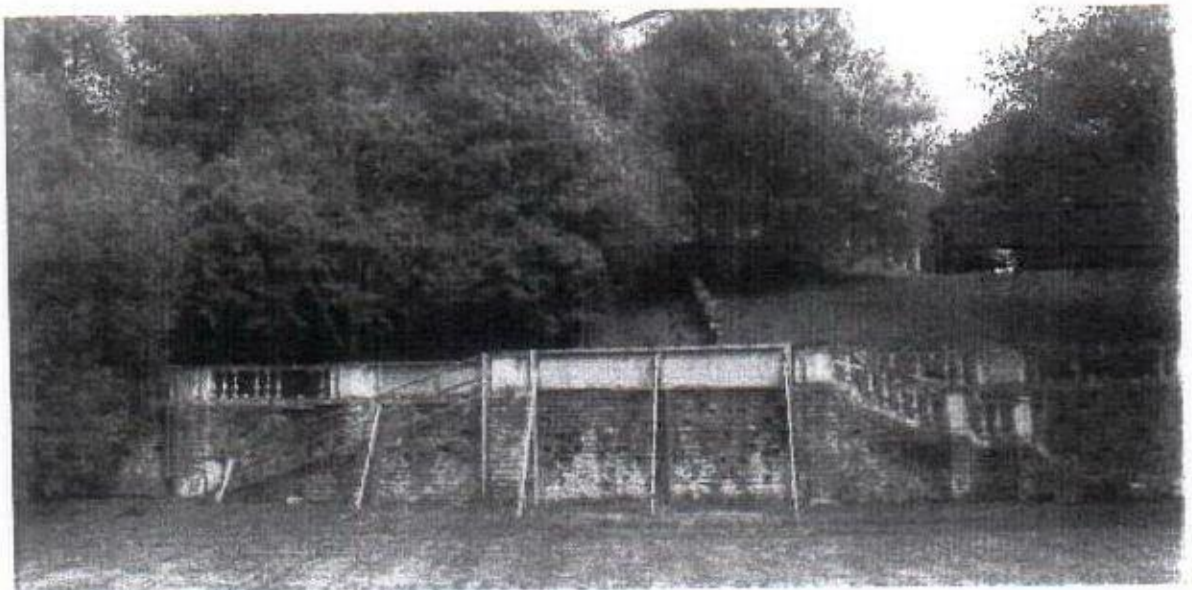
GRAND STAIR, LOWER TERRACE 13
